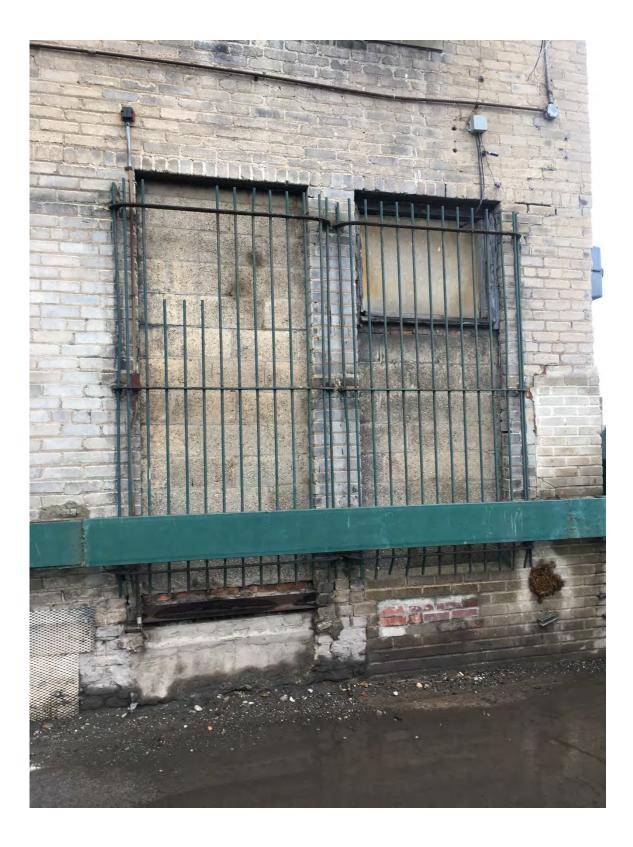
Exterior, North Façade, Looking south. 6/17/2019
